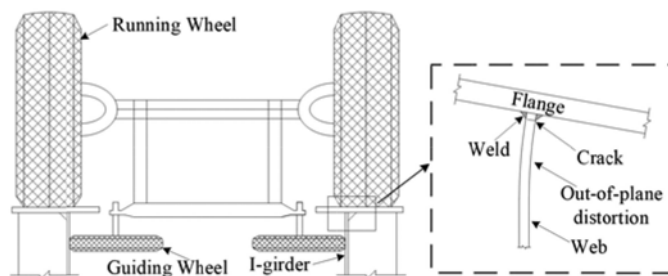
Out-of-plane distortion at the flange-web welding detail.
